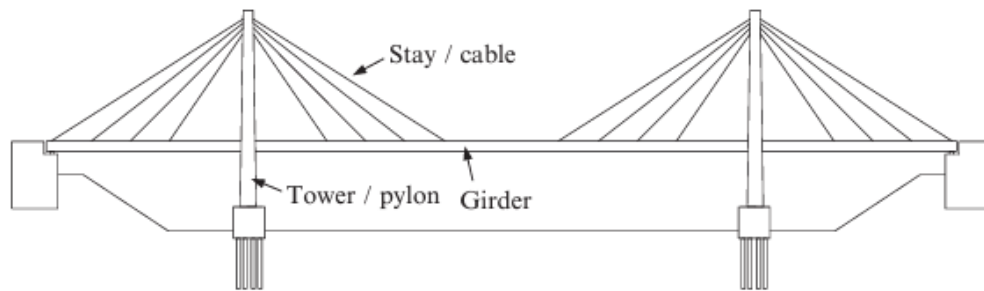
A TYPICAL CABLE-STAYED BRIDGE (WEIWEI & TERUHIKO, 2017).
